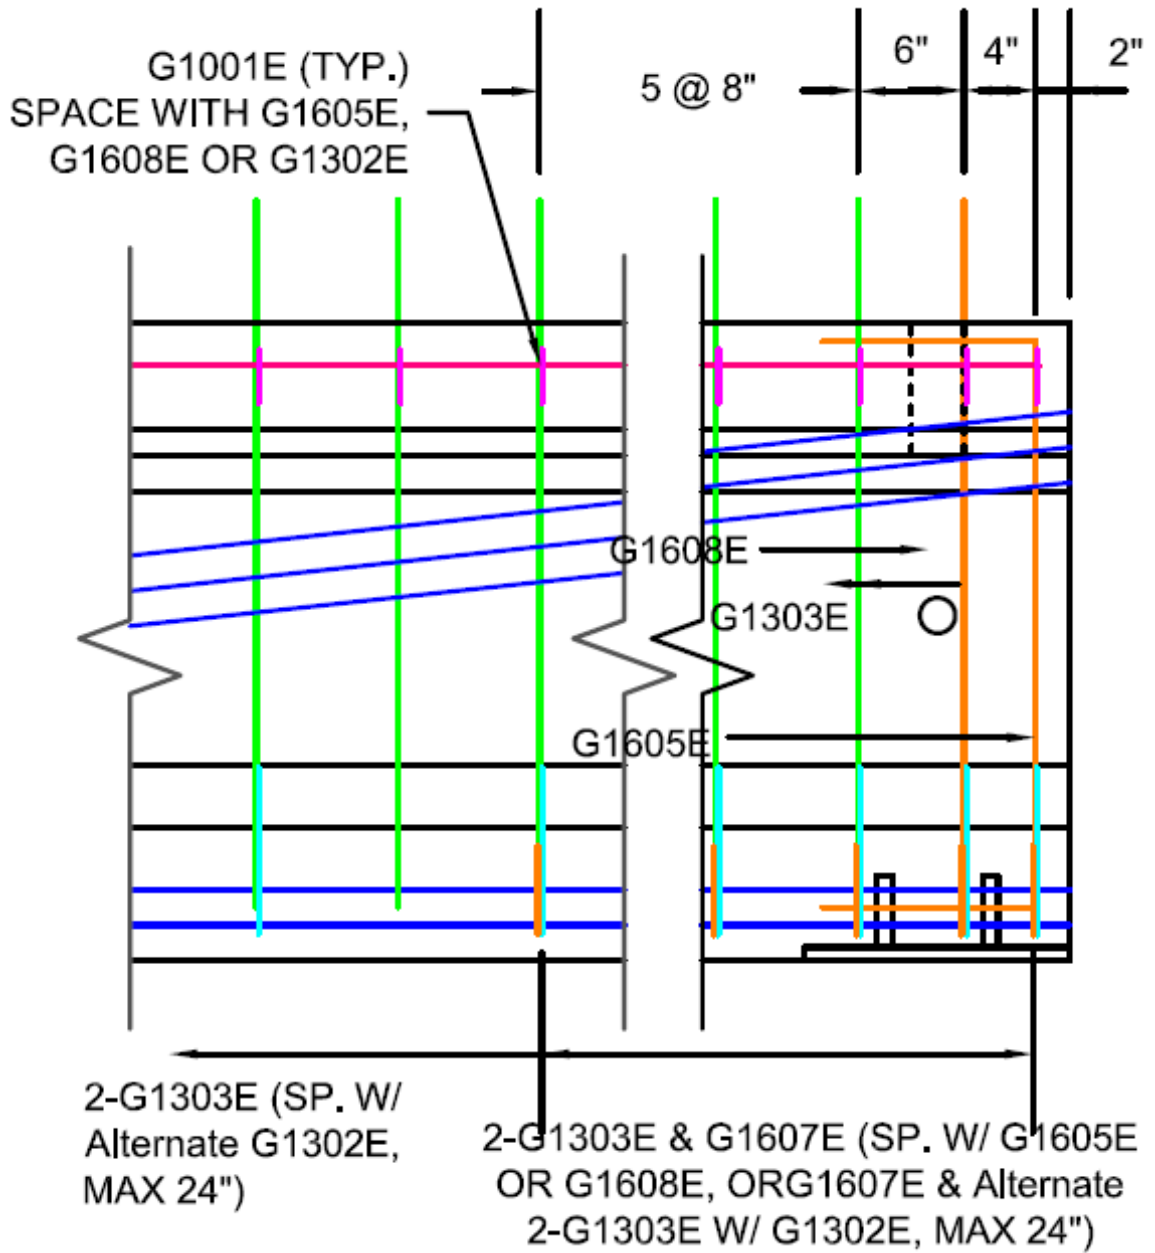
Transverse reinforcement layout for 36M_8W end.
